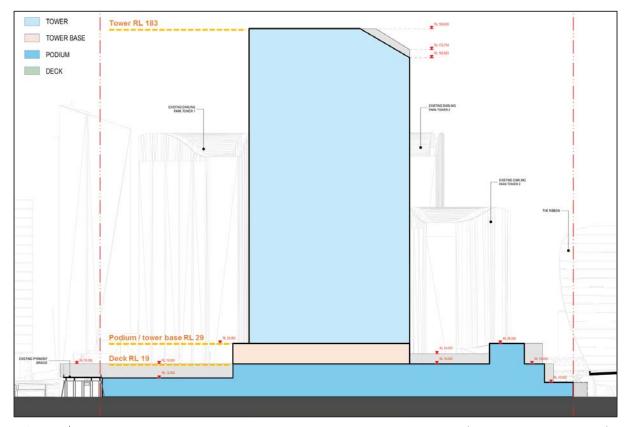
| The western elevation of the maximum building envelope facing Darling Harbour (Base source: Applicant's RtS)
